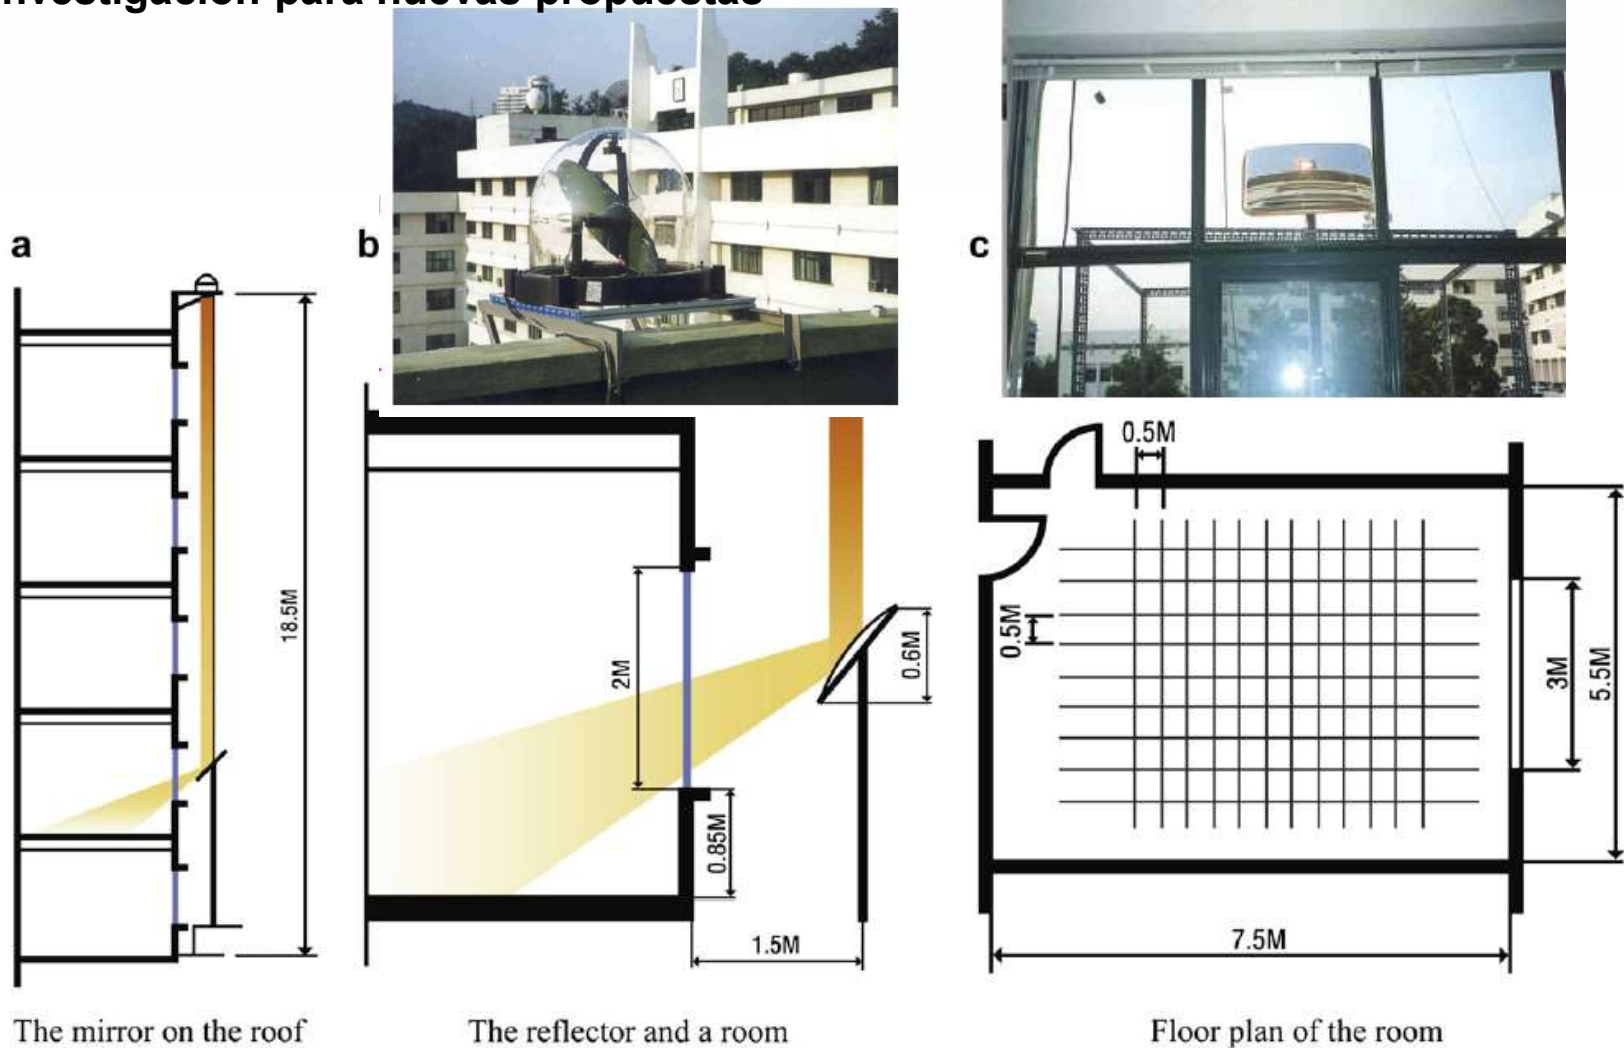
Layout of the mirror system and room geometry. (a) The mirror on the roof, (b) The reflector and a room. (c) Floor plan of the room.
